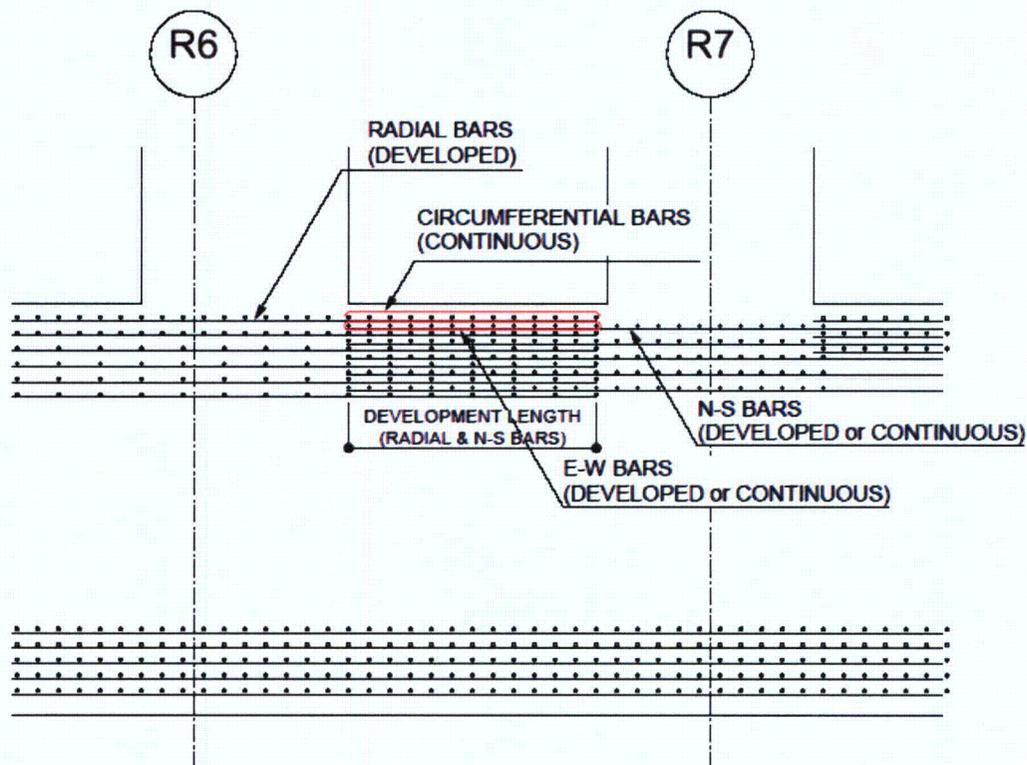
(1) Rebar Arrangement in Basemat around Cylindrical Wall below RCCV
